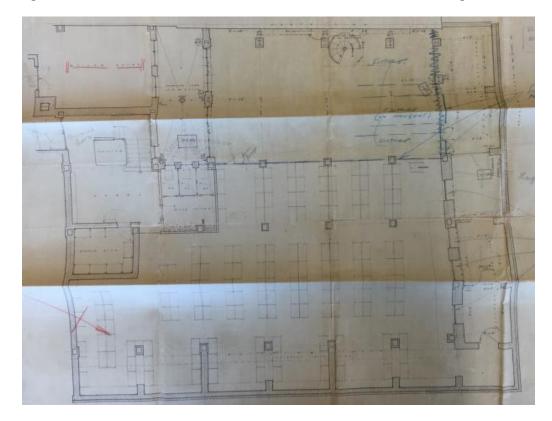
Basement Plan of Summit House dated 1932 (office element only)
